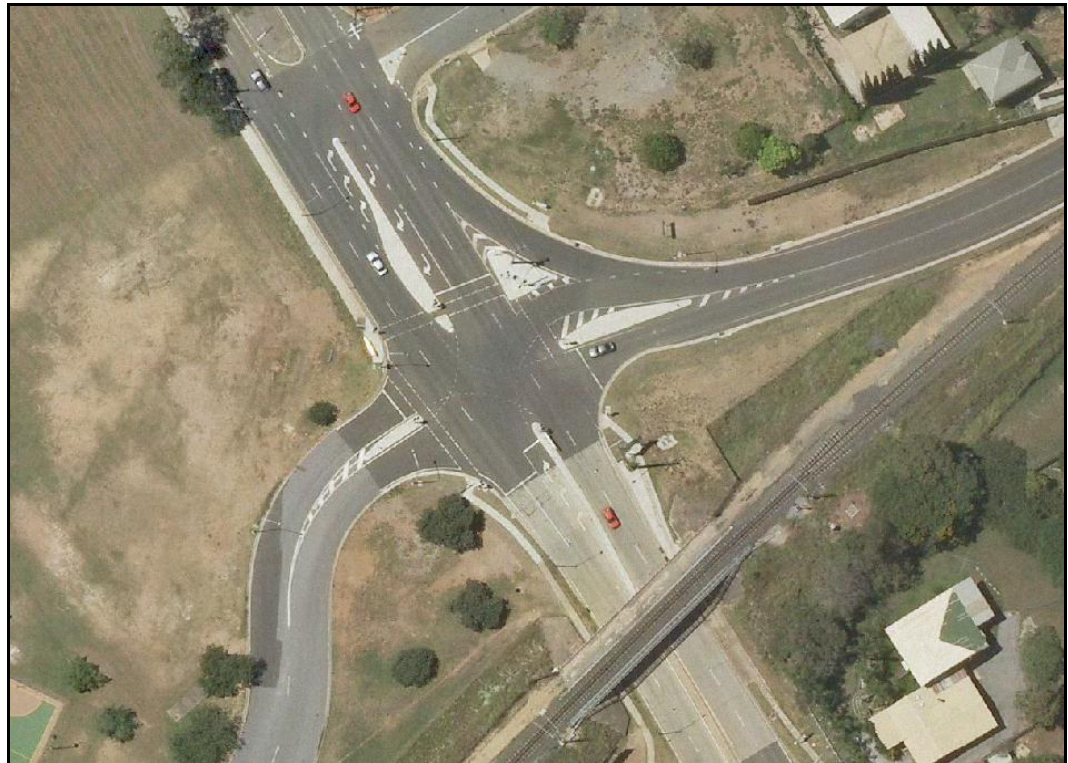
Glenlyon Street/ Gladstone Port Access Road – Existing Layout
